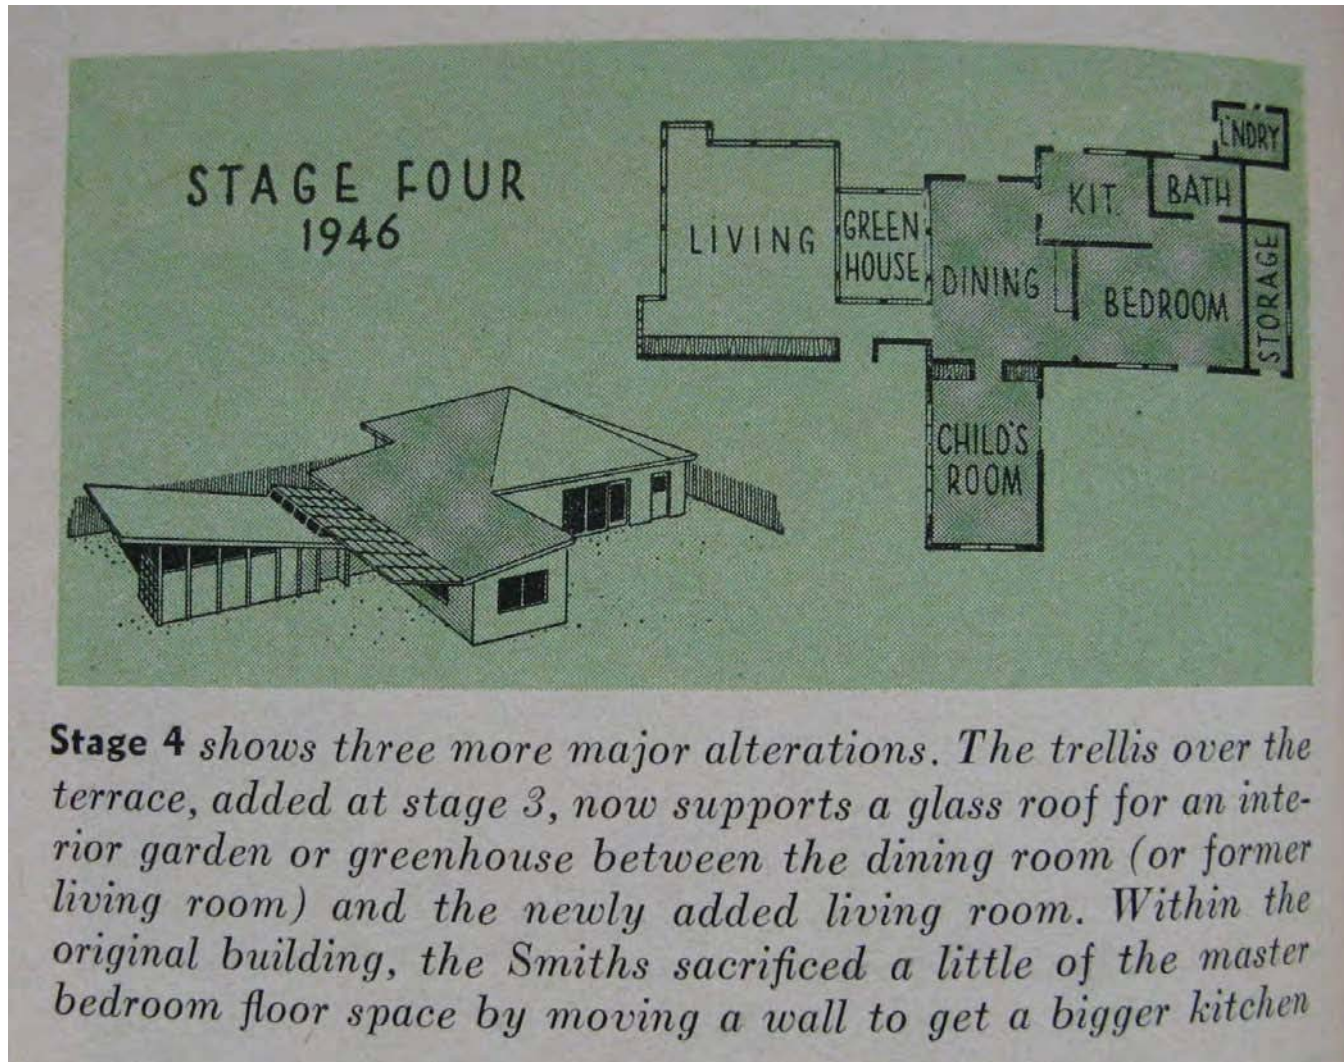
In 1946, Smith added a new living room, capped with a subtly sloped butterfly roof, and enclosed the terrace trellis with a glass roof, creating a greenhouse between the dining and living rooms. Source: *Sunset Magazine*, April 1954.
